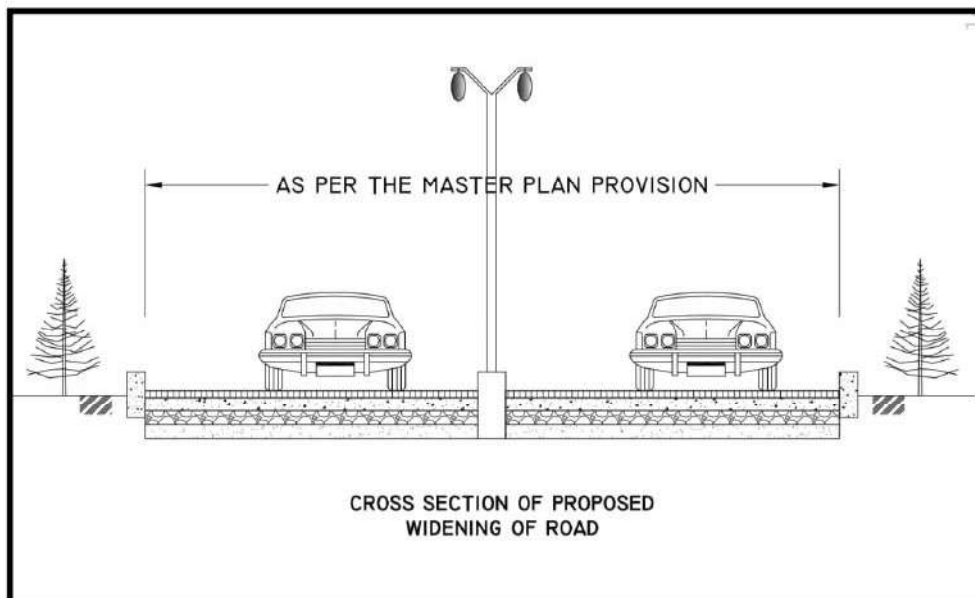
Cross-sectional drawing of proposed road widening in Sootea Master Plan
